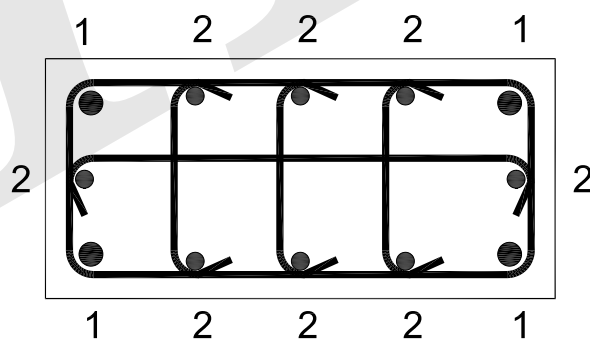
Typical rectangular column section – Bars mark 1 indicate four corner bars contributing to design resistance at floor joint, bars mark 2 are smaller bars in height of column to satisfy Code detailing rules.
